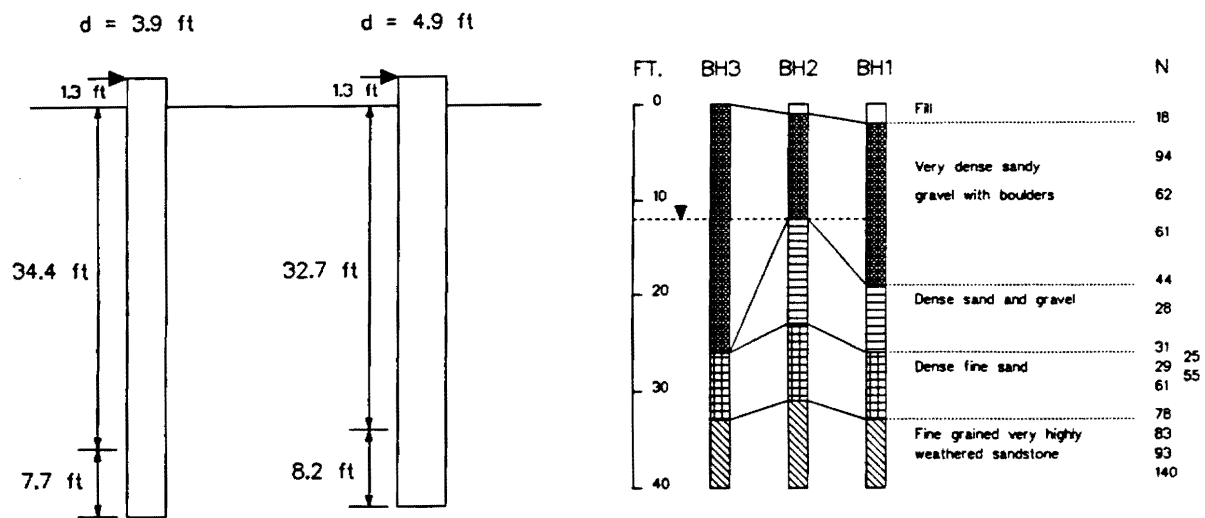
Geotechnical Information and Shaft Details for Socketed Drilled Shafts E and F in the U.K. (from Lyndon, et al., 1989).
